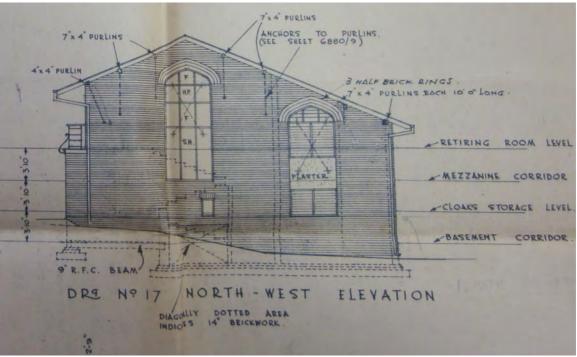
Lady Member's Building elevation (KCC MSWOO)
